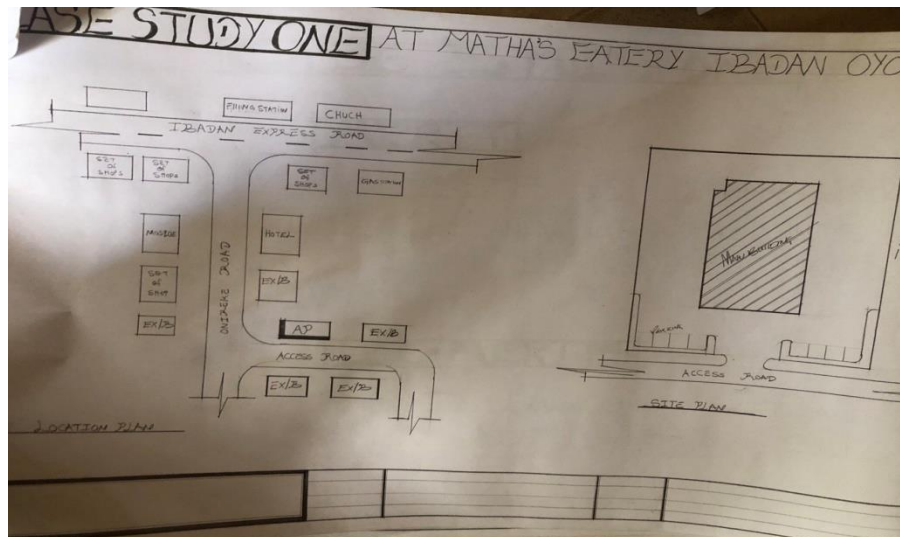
LOCATIONAL PLAN OF CASE STUDY ONE
